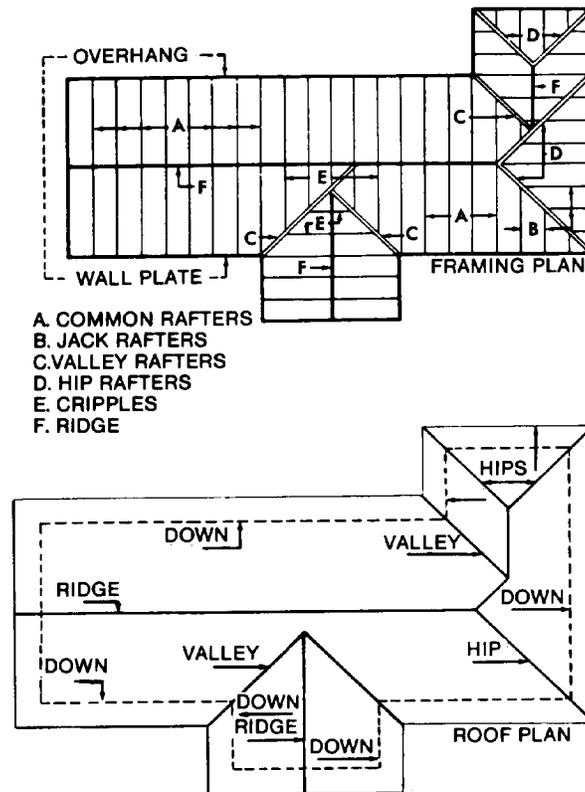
ROOFING TERMS AND TYPES OF RAFTERS.
